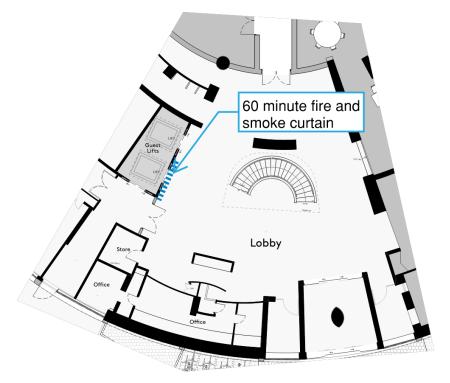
Fire Curtain Location – Ground Floor i.e. Hotel Building
